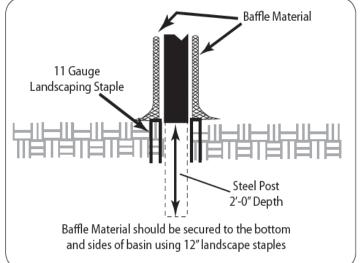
Coir Fiber Baffle Detail Cross section of a baffle in a sediment basin.
